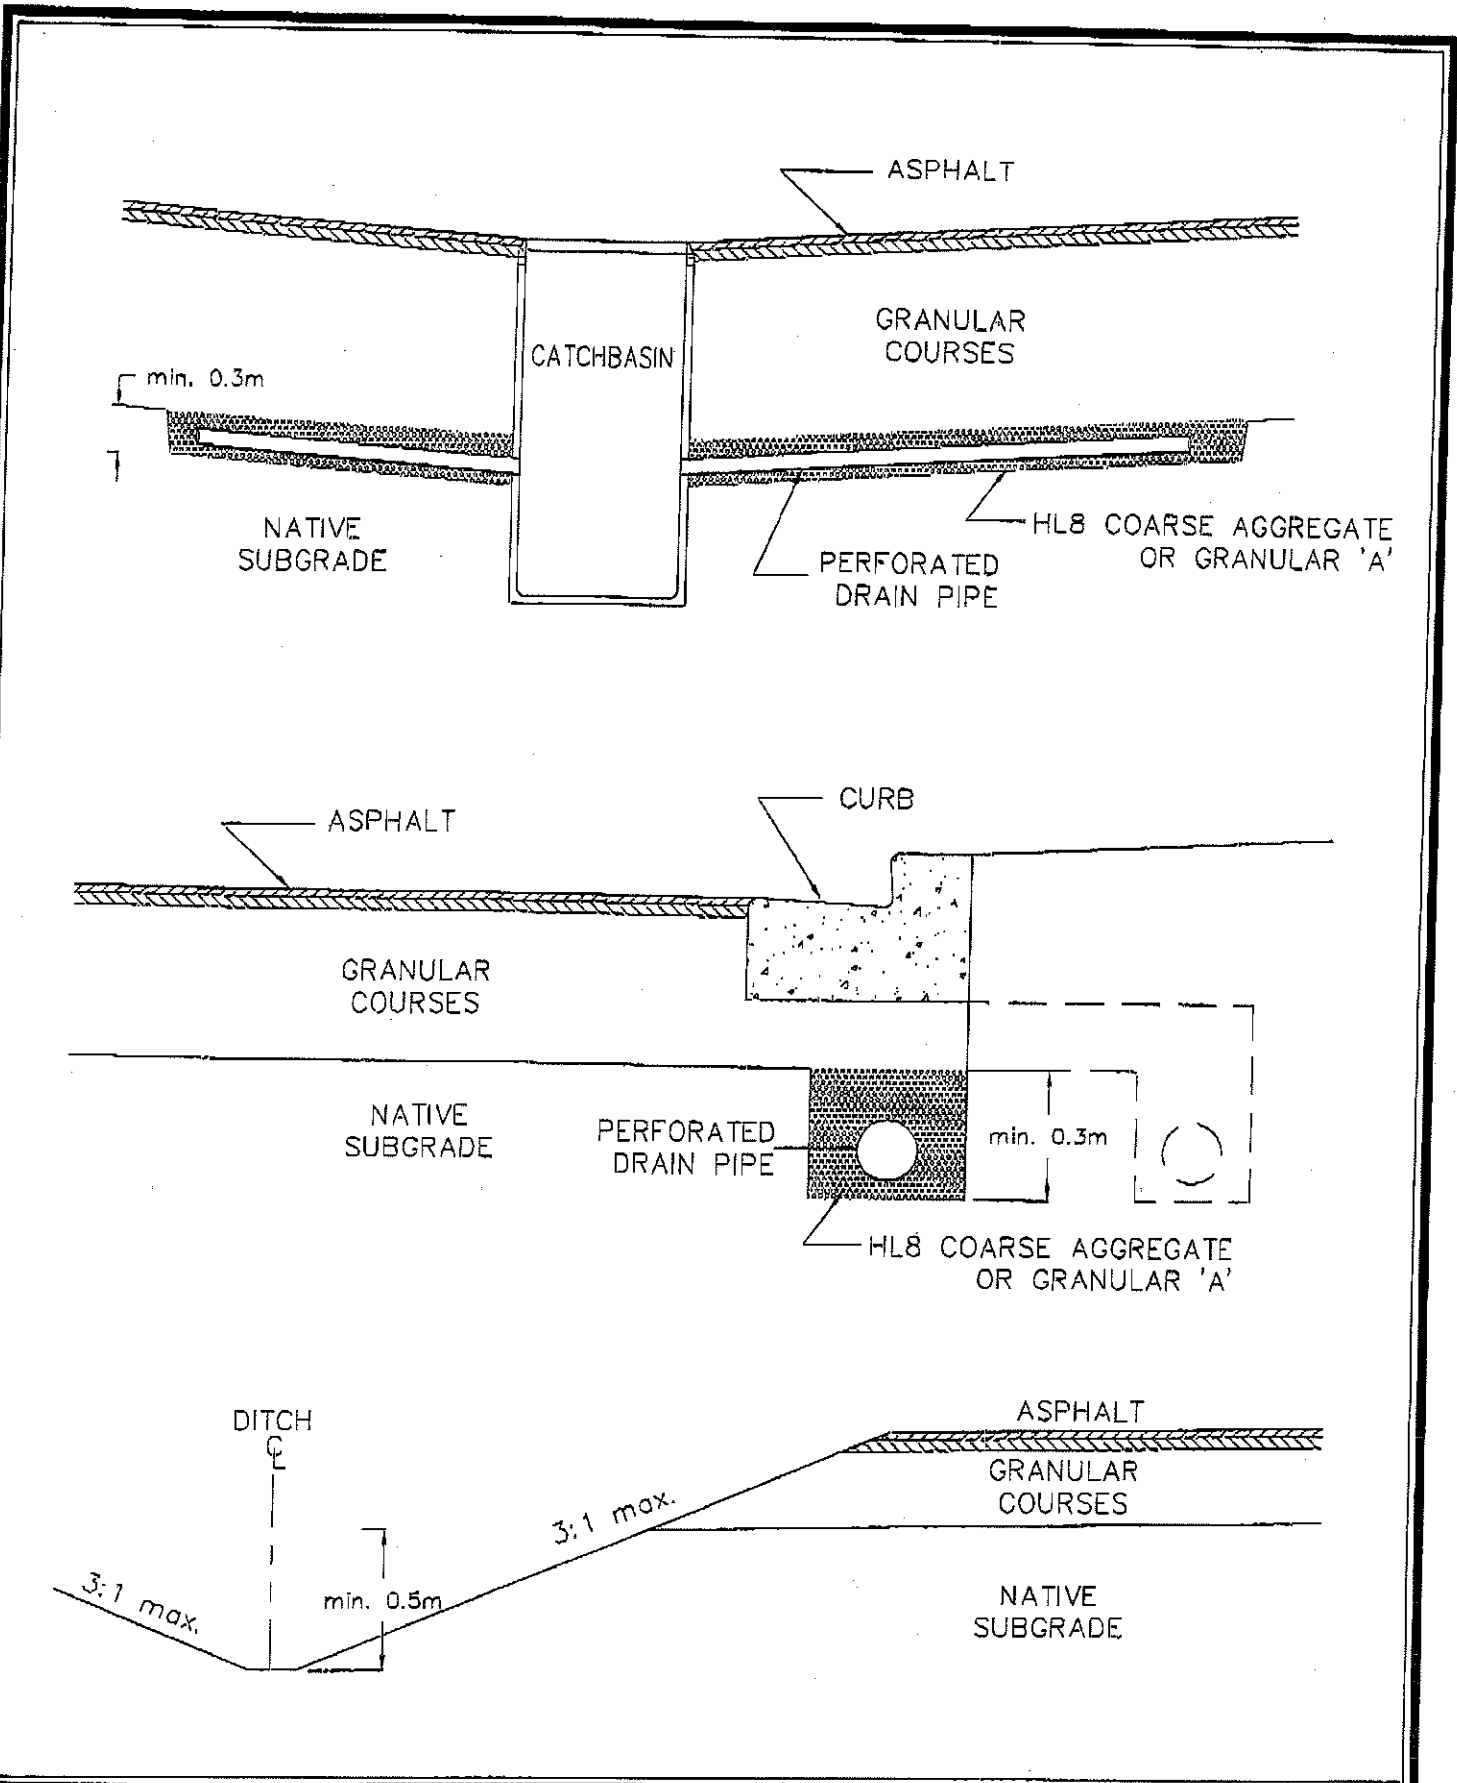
DETAIL A SUBDRAINAGE DETAIL WITH CLEAN-OUT
